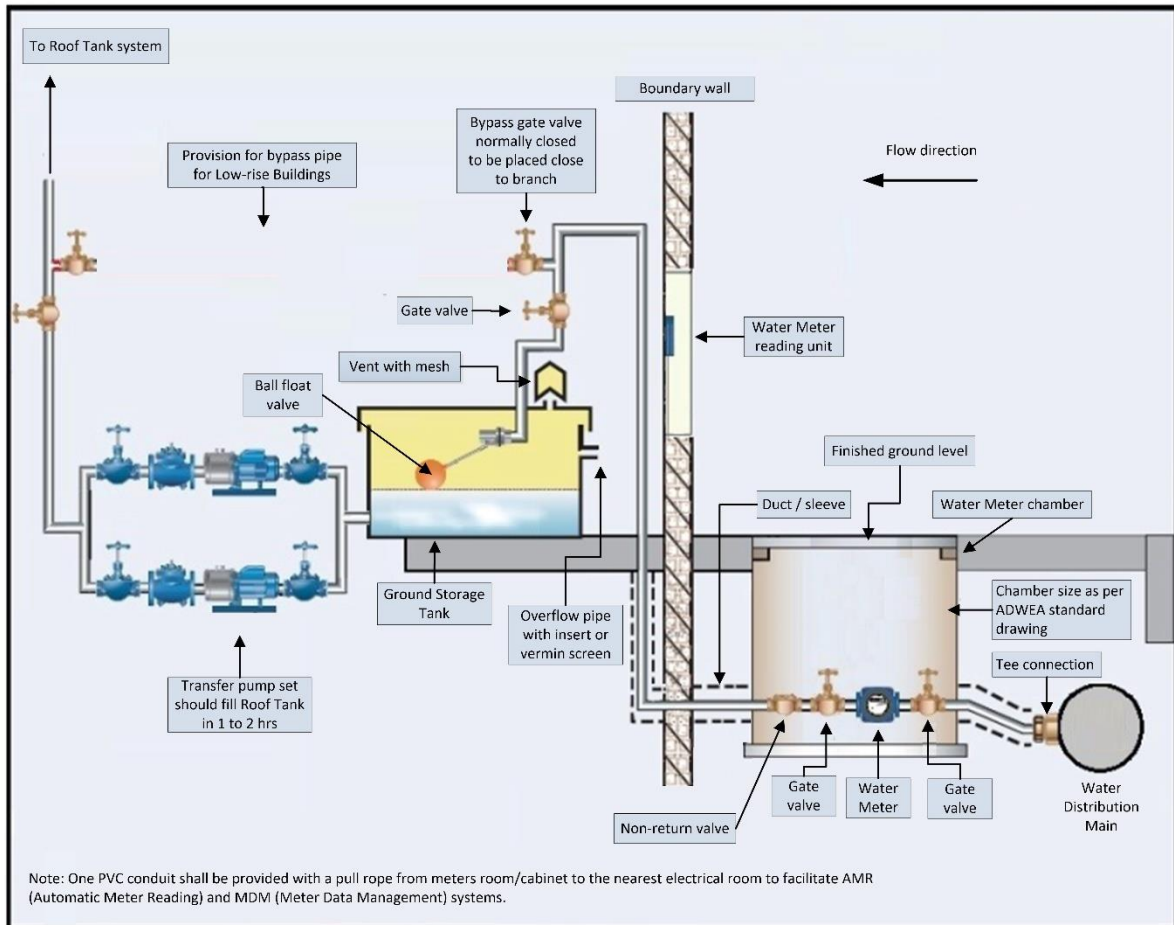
A typical connection arrangement for a water Service Connection larger than 50mm
